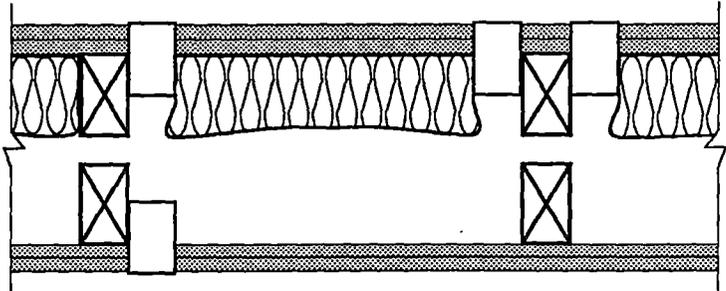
(c): Positions of electrical boxes in the double stud wall. This construction was the same as in Figure 1(b), but with 90 mm glass fibre batts installed against the studs and between outlets.
